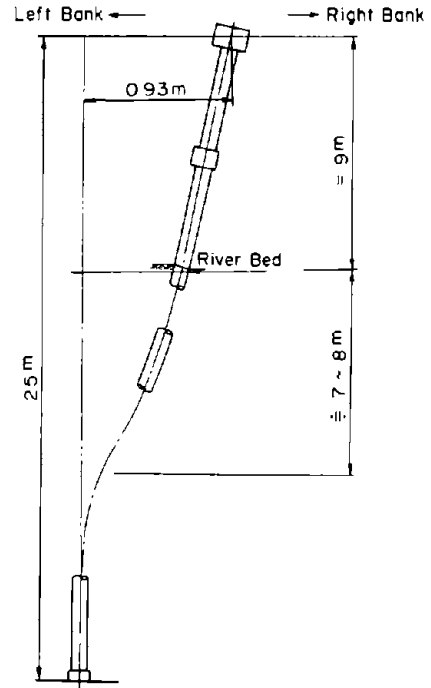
Deformation of a Steel Pipe Pile of Pier No. 4 (P₄)⁸⁾
